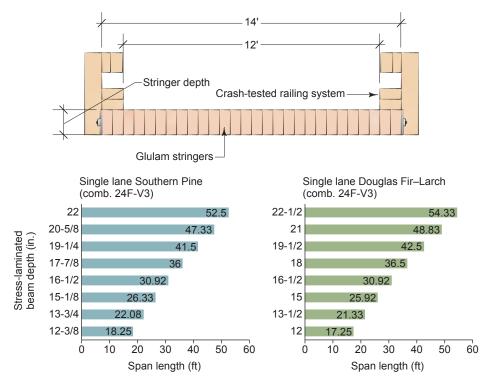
Stress-laminated glulam deck section and span charts of single lane bridges.
